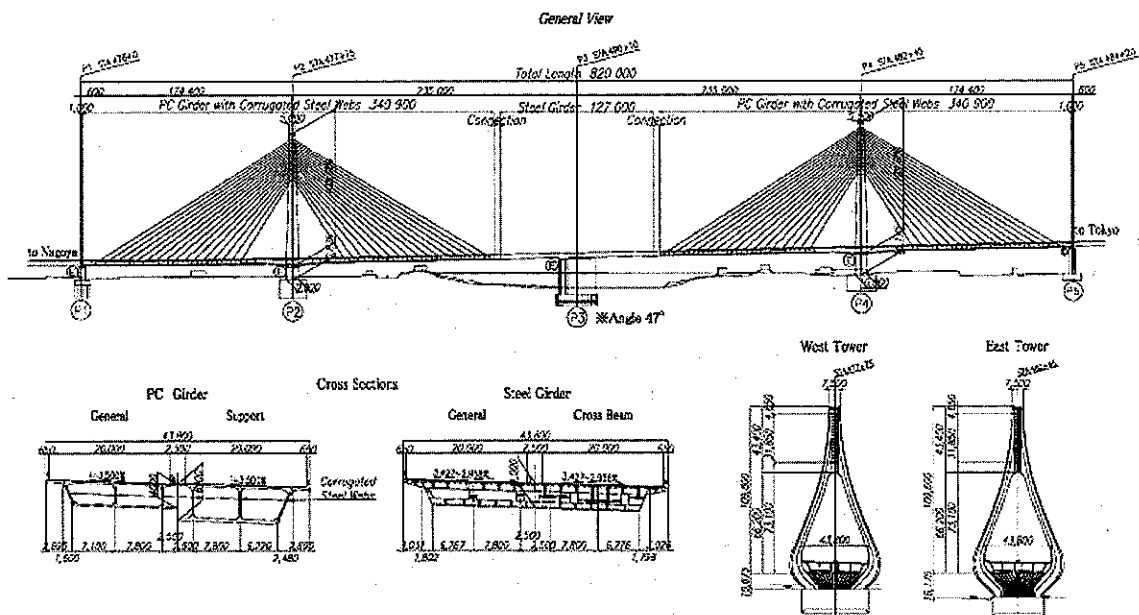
Side view and sections of YAHAGI-GAWA Bridge
